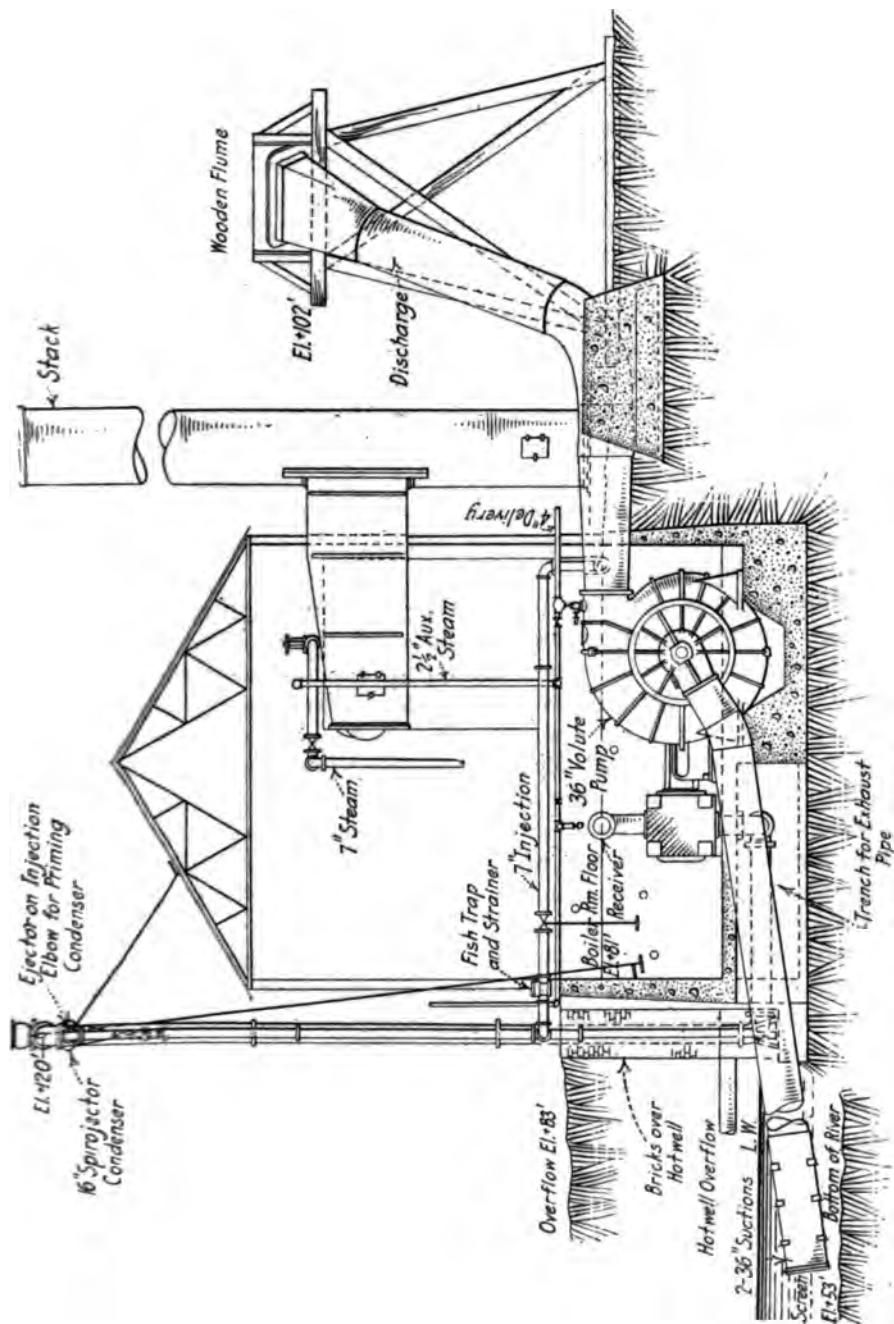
END ELEVATION OF PUMPING PLANT, GARWOOD IRRIGATION COMPANY
